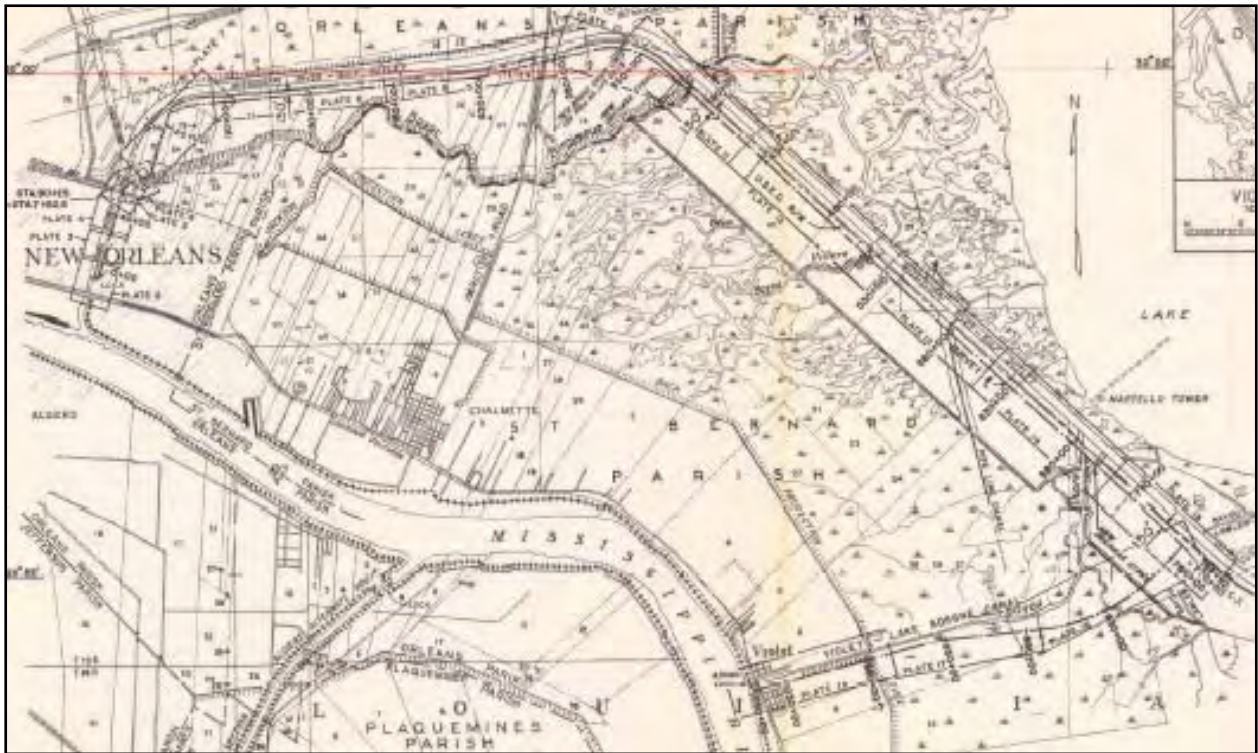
Pre-1966 Levee Sections and Soil Borings are Shown in Plates 2 thru 18 in DM3ChalmetteArea.pdf
